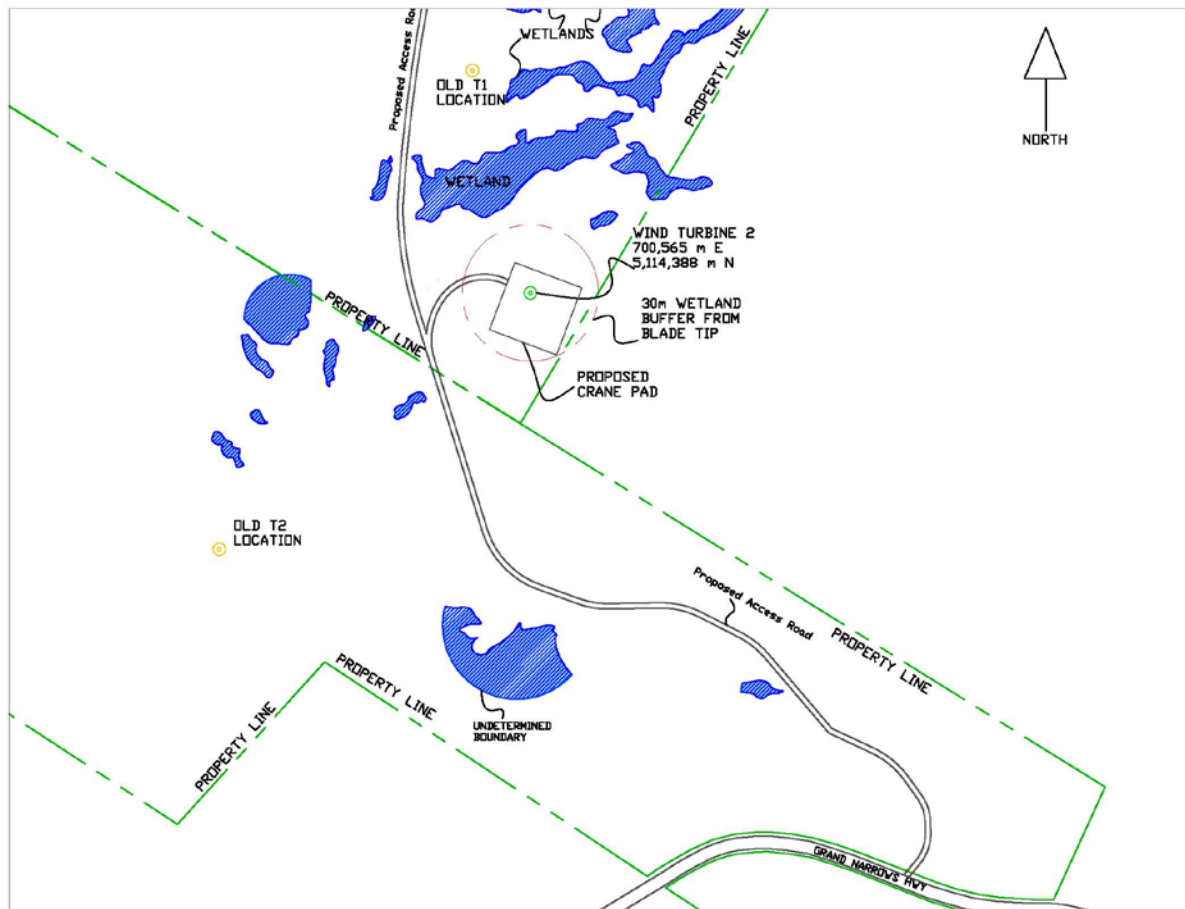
Lower Project site showing delineated wetlands and proposed access road design.
